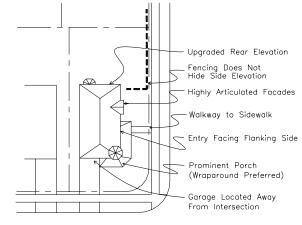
Conceptual plan view of corner dwelling
